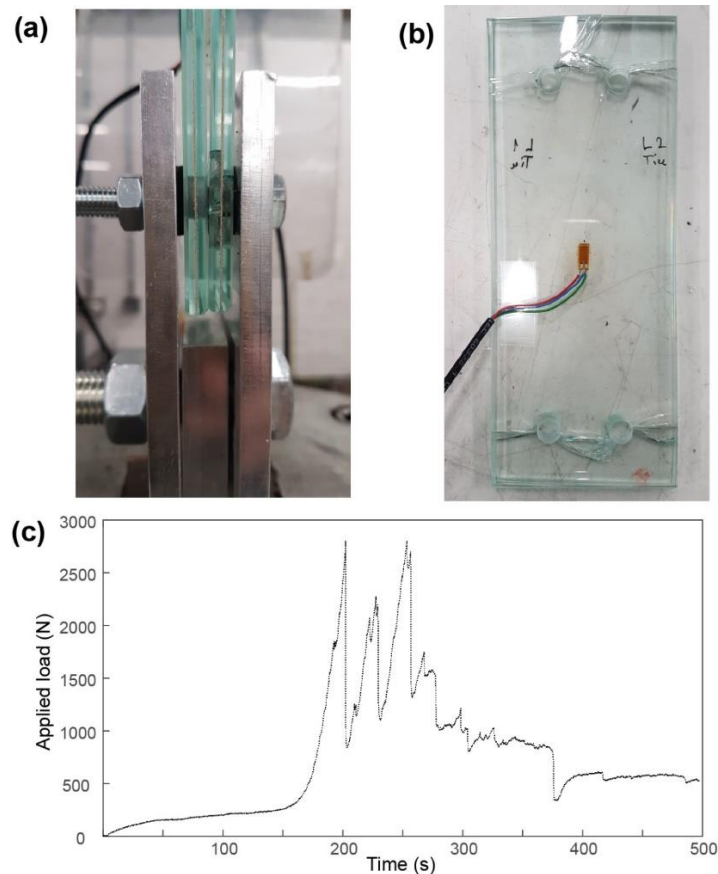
Reinforced tempered glass test specimen: (a) failure pattern, (b) GFRP reinforcement held broken glass pieces in the vicinity of the bolted joint
